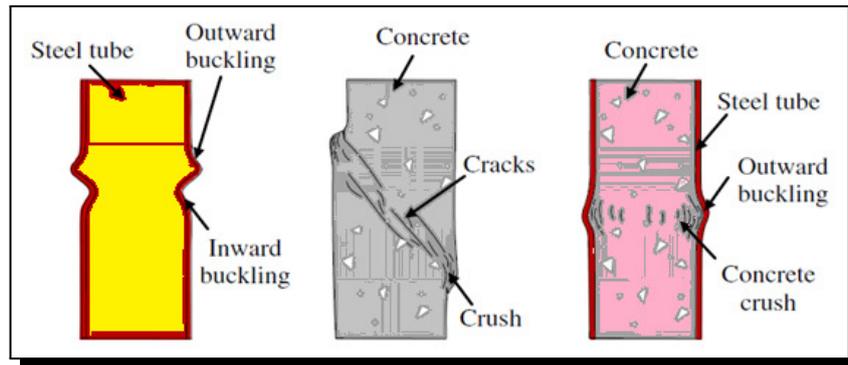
Schematic failure modes of the HST, RCC and CFST columns
